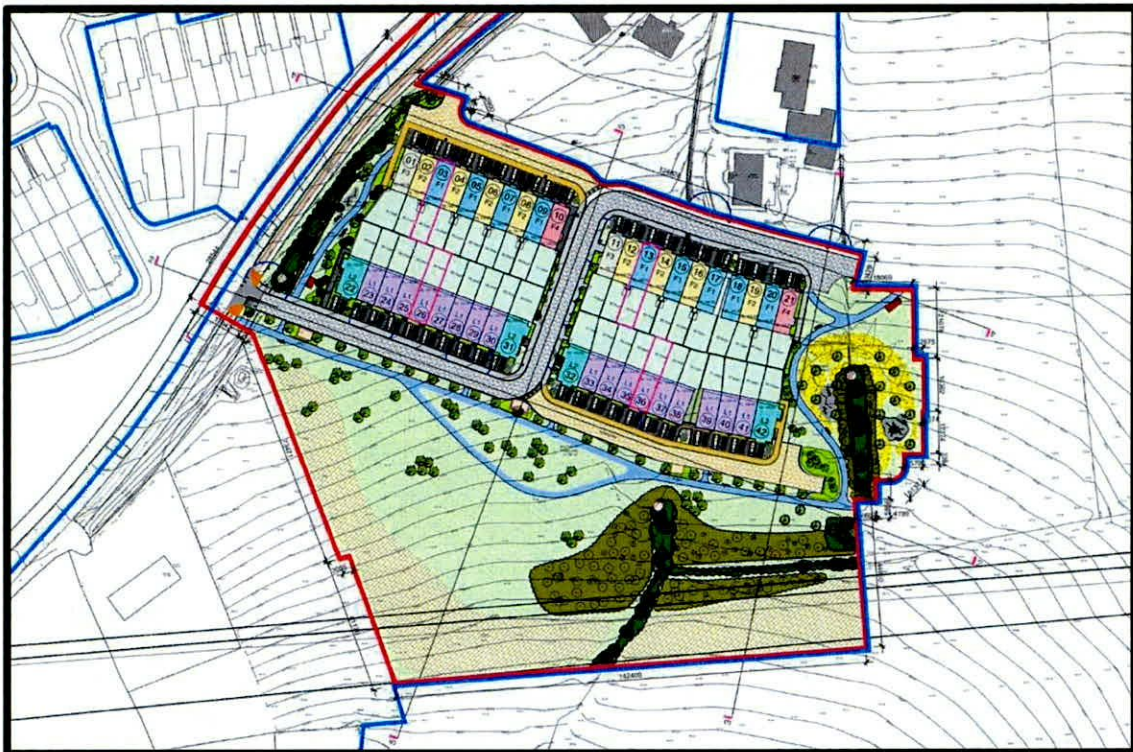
Extract from Site Layout Plan, Drawing No. P006
